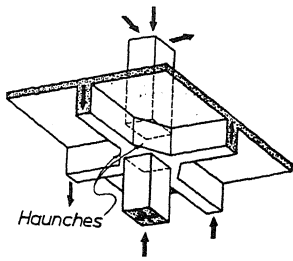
An Interior Joint Formed by Horizontal Beam Haunches.
